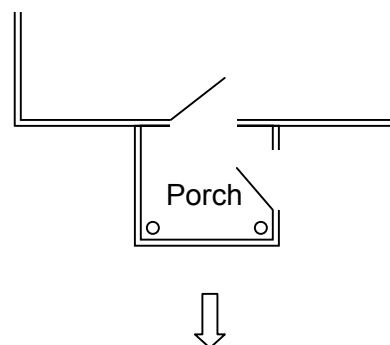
Existing covered area and diagram of possible added vestibule wall
